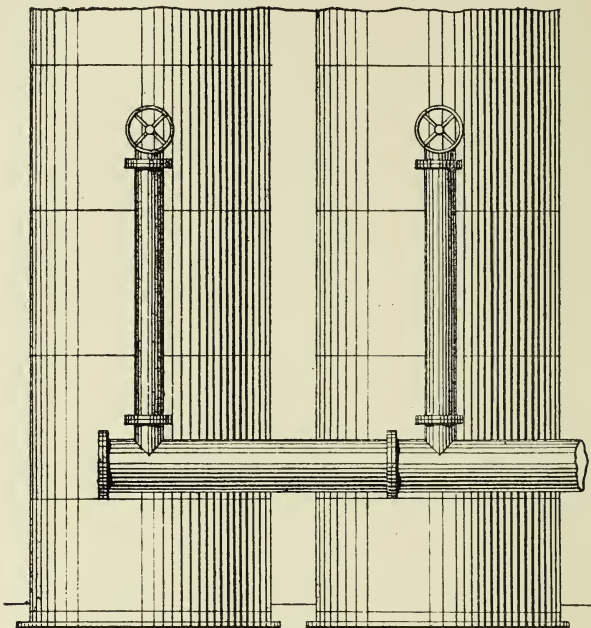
APPROVED METHOD OF CONNECTING STEAM PIPES WITH BOILERS.
